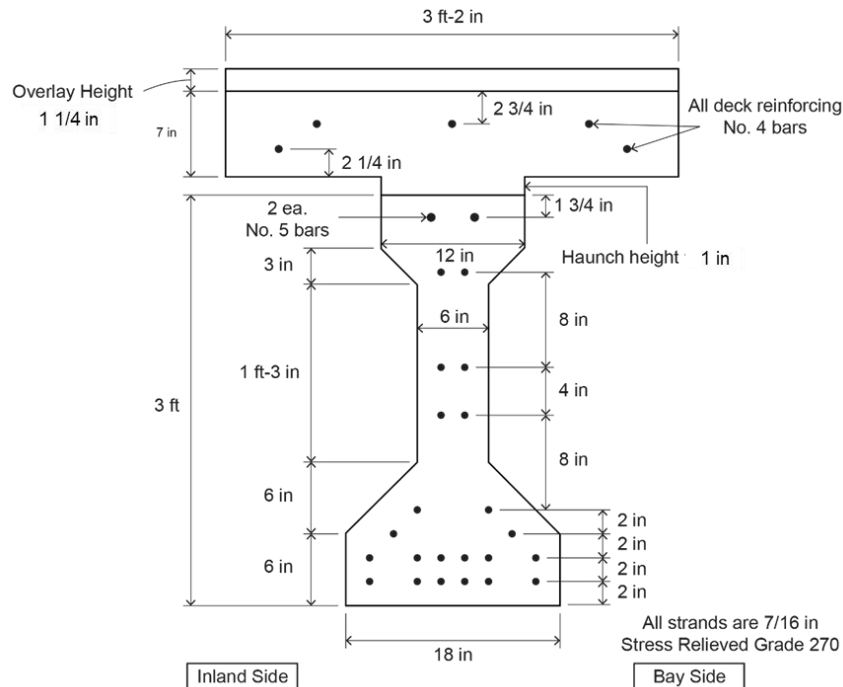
Cross-Section of Lesner Bridge I-Beam 9 from Alfailakawi (2019)
